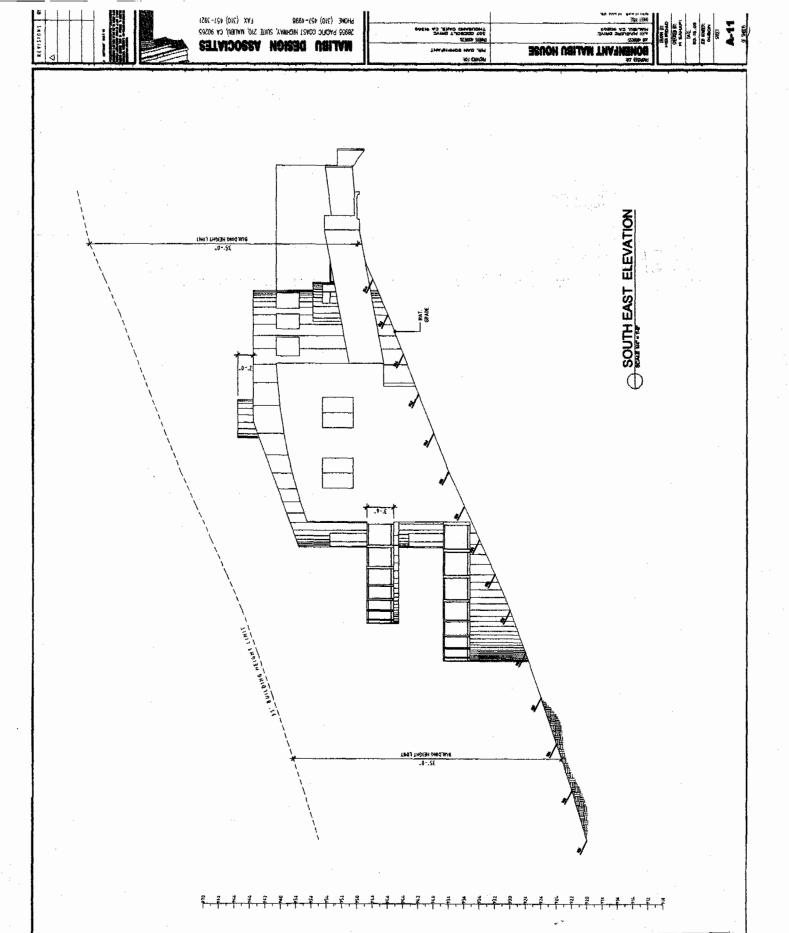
App. No. 4-06-018 Bonenfant Southeast Elevation
